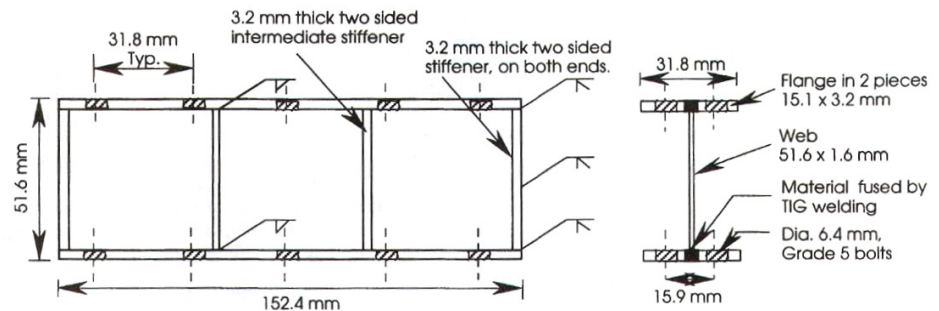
Rai and Wallace's experimental activity (1998): geometrical details of a typical tested specimen
